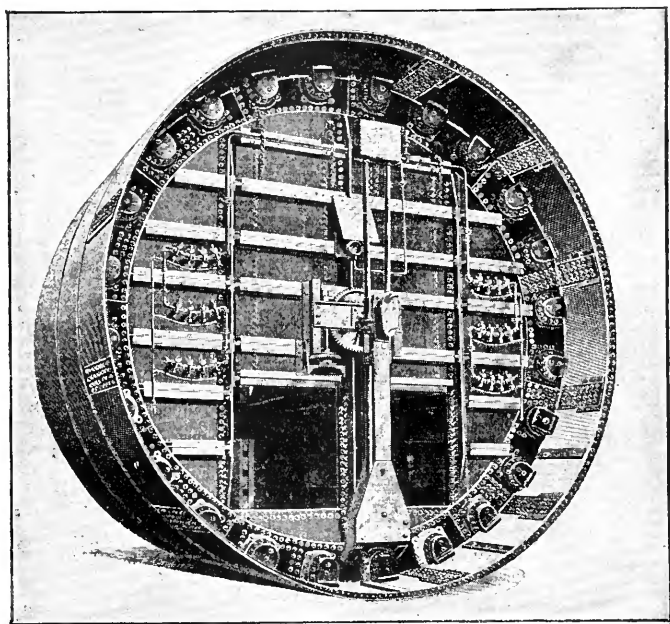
SHIELD USED IN THE TUNNEL EXCAVATION.
